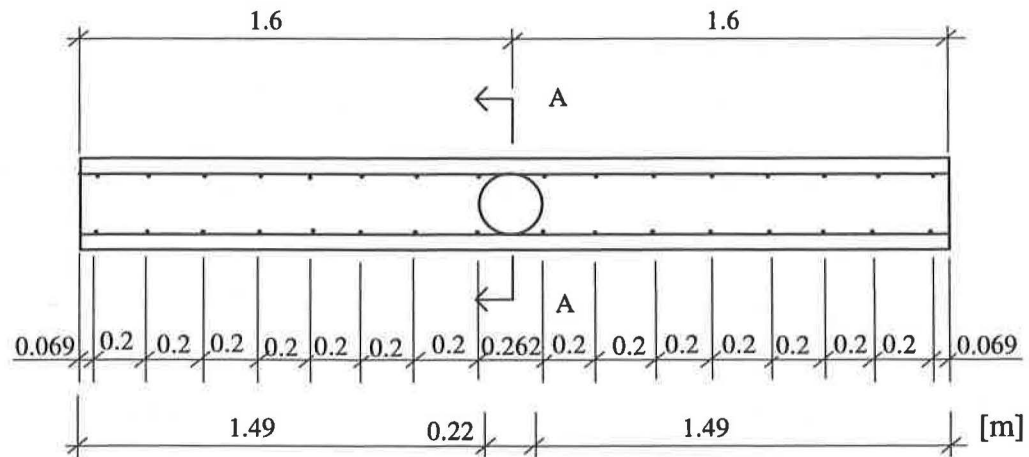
Reinforcement detailing of specimen RV12 (side elevation).
